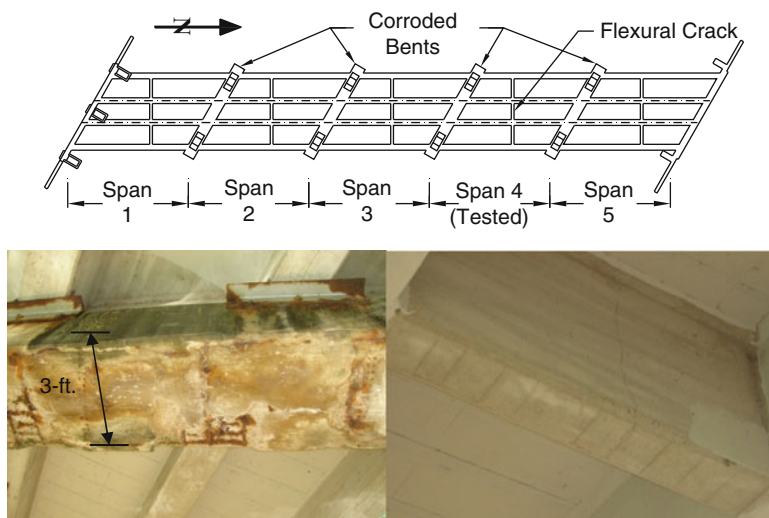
Bridge T-530 corrosion of bents and cracked transverse beam
